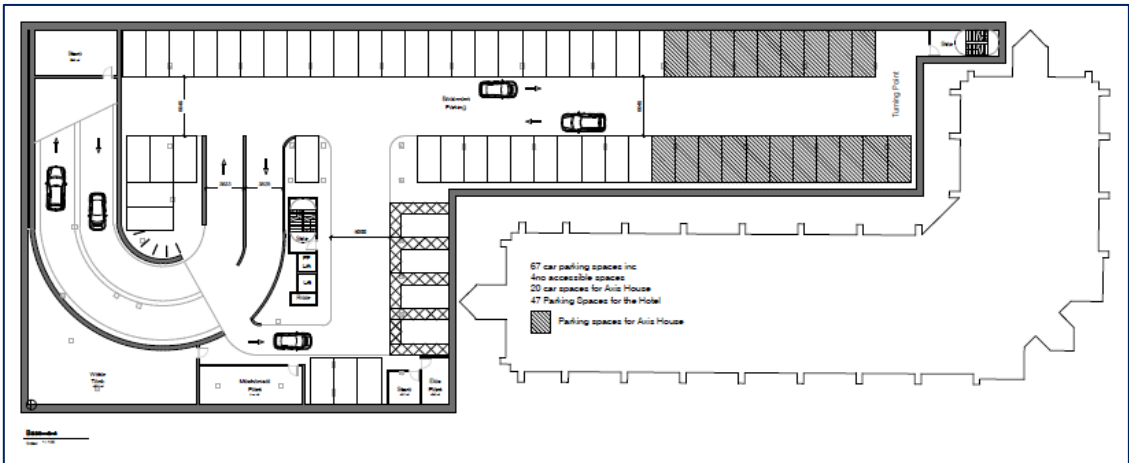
Proposed site and basement plan [Ref. 1.0a]
